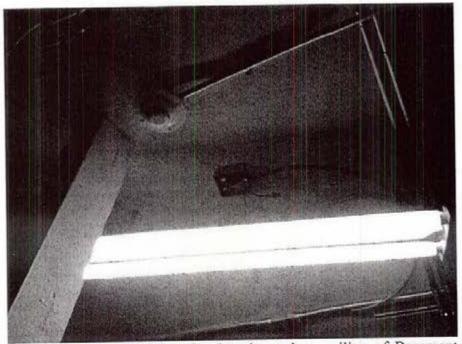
Uncovered junction box located on ceiling of Basement Supply Room 011.
